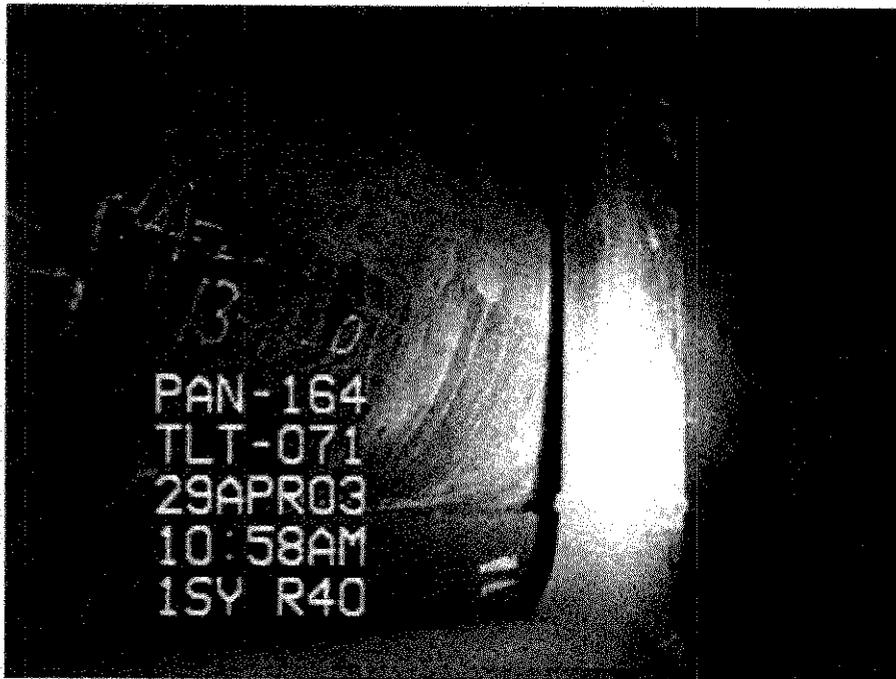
SY-101 Riser 40, Primary Tank, Knuckle Weld (2003)
